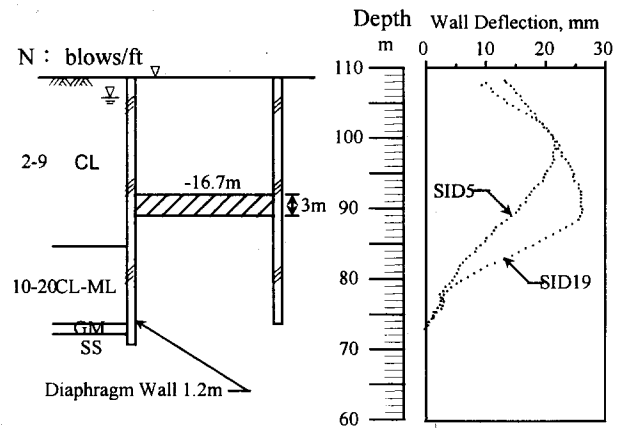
Wall Deflections - Job 8 With Grouted Slab
